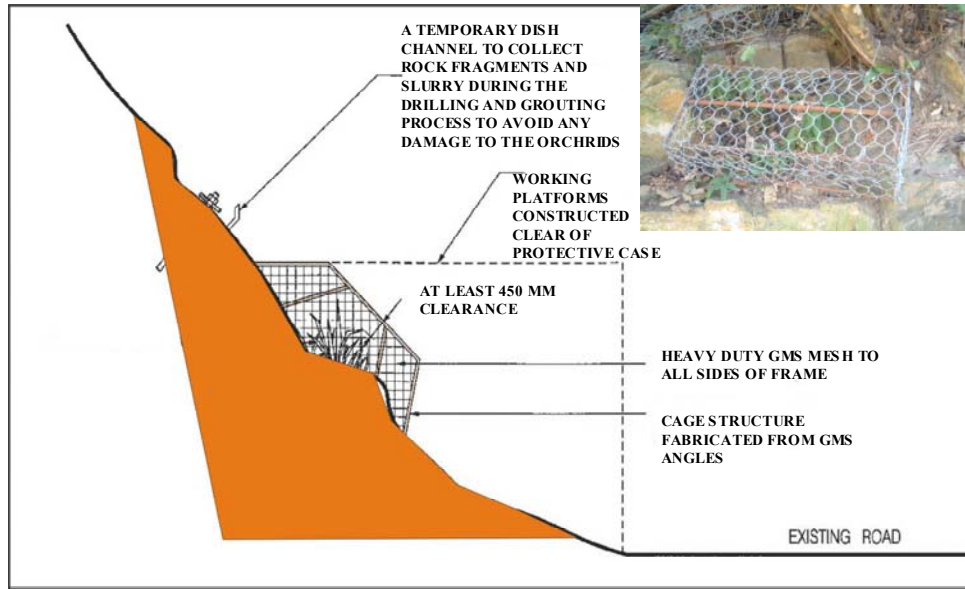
Measures for protecting wild orchids in slope upgrading work sites
